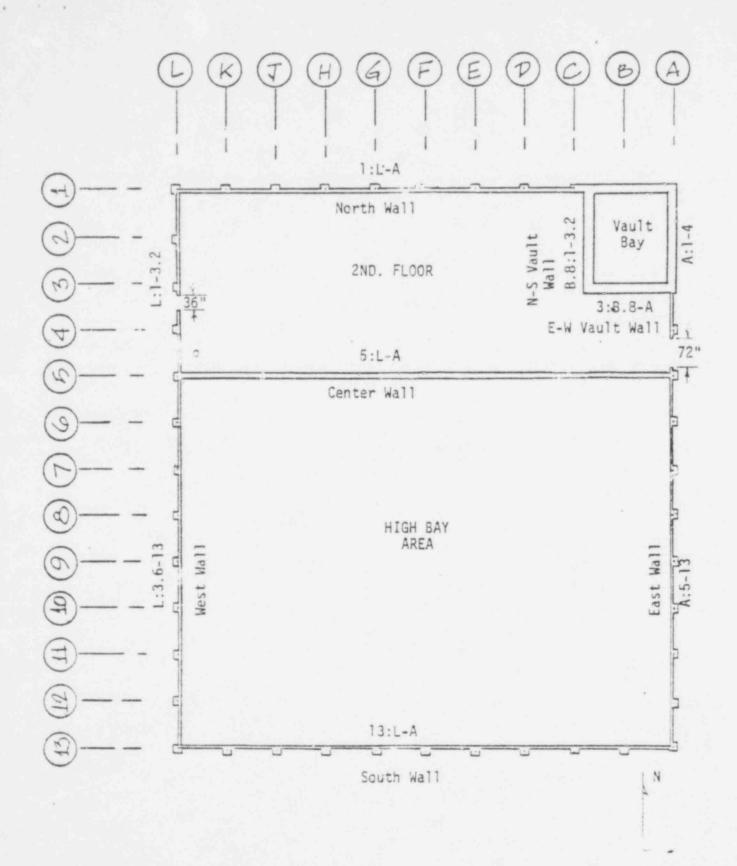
(b) 2nd. STORY STRUCTURAL WALL ELEMENTS
